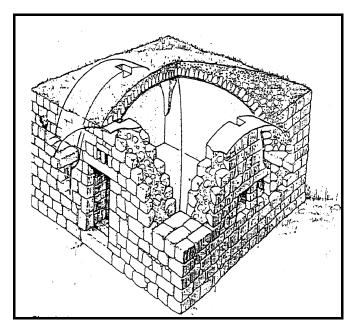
Sketch showing the peasant house cross vault and walls (Hirschfeld, 1995:129)
